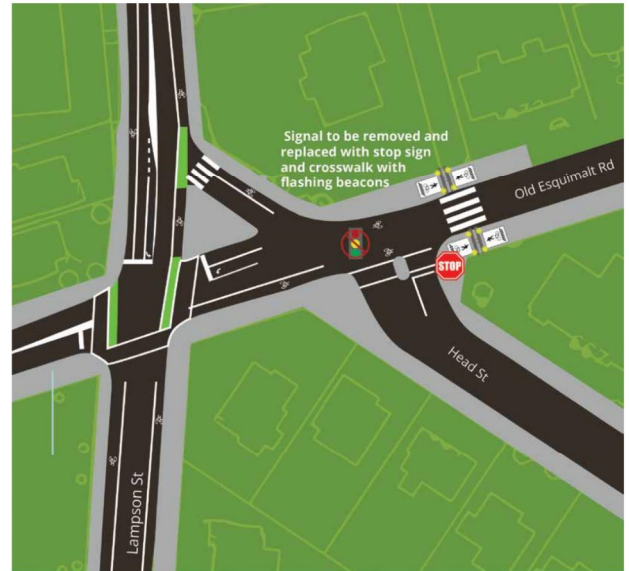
IMAGE: REPLACEMENT OF TRAFFIC LIGHT WITH CROSSWALK AND FLASHING BEACONS
